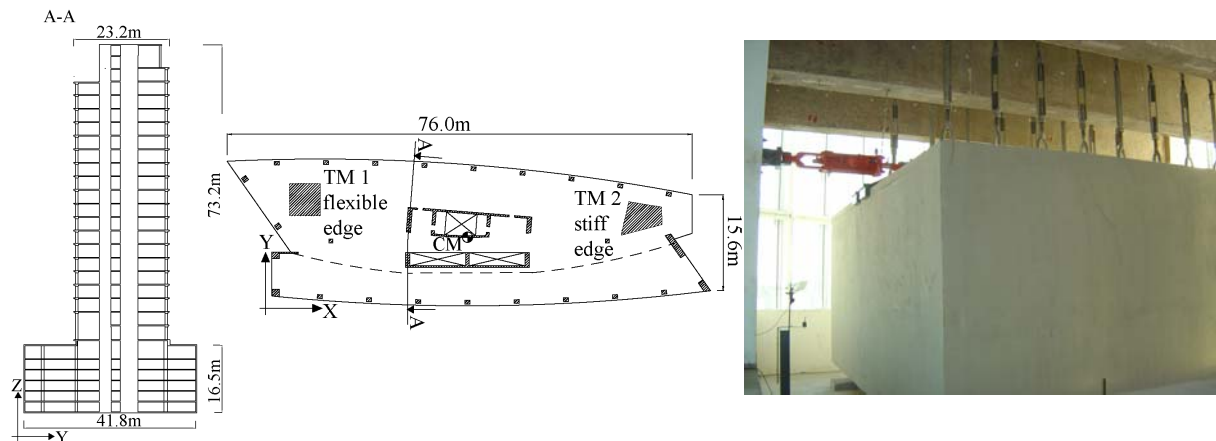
Building setup with TM and proof-of-concept MR damper on the flexible edge TM in Y-direction
